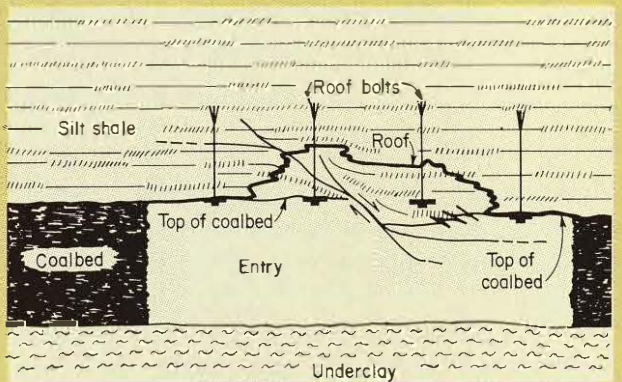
Subtype G₄ roof failure attributed to faults.
